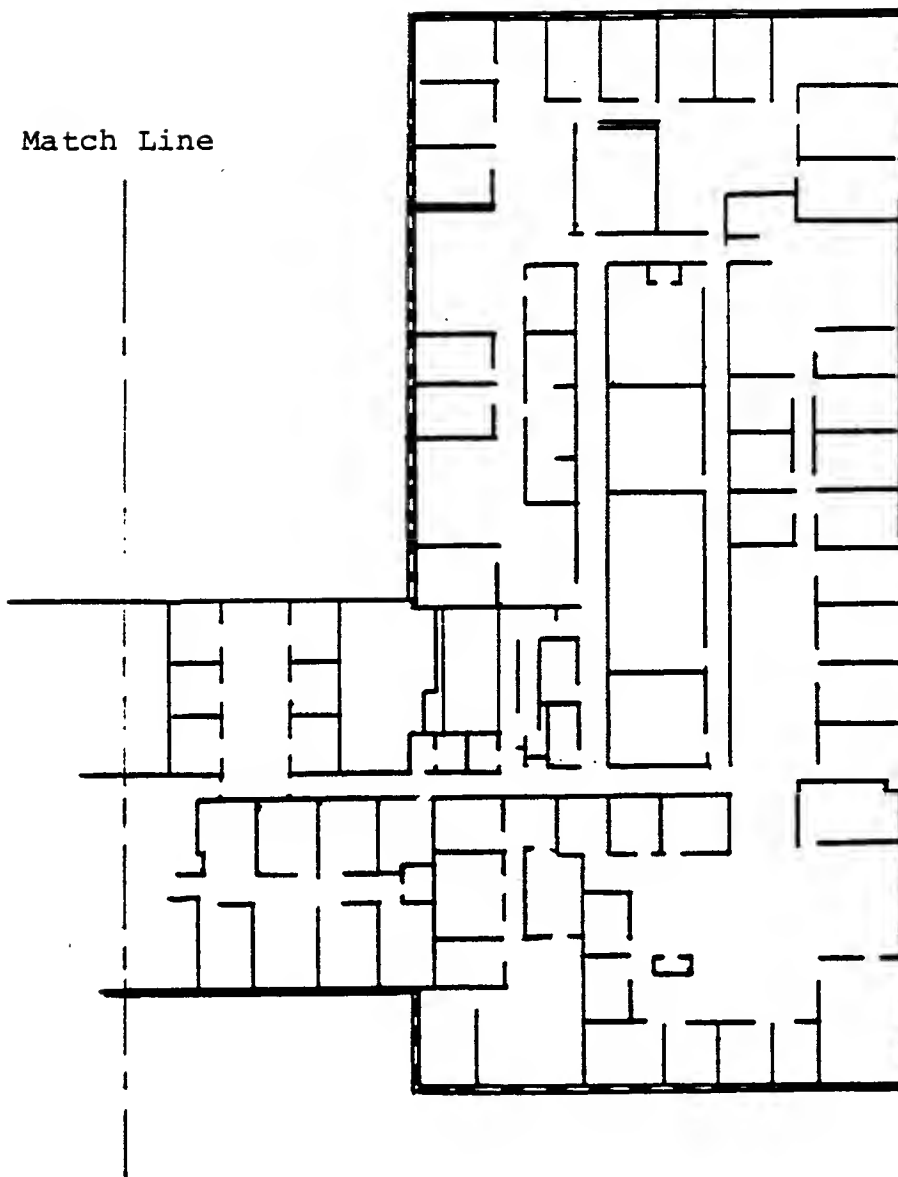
USIA BUILDING SEVENTH FLOOR-NORTH
